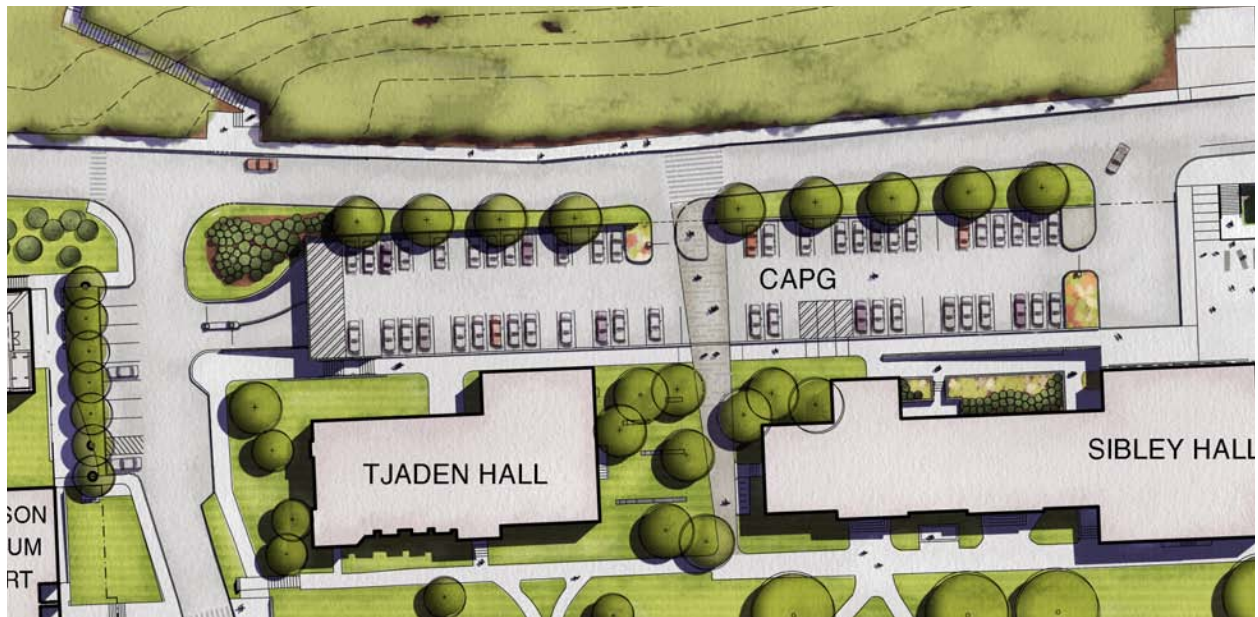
Illustrated site plan, surface level of the CAPG.
